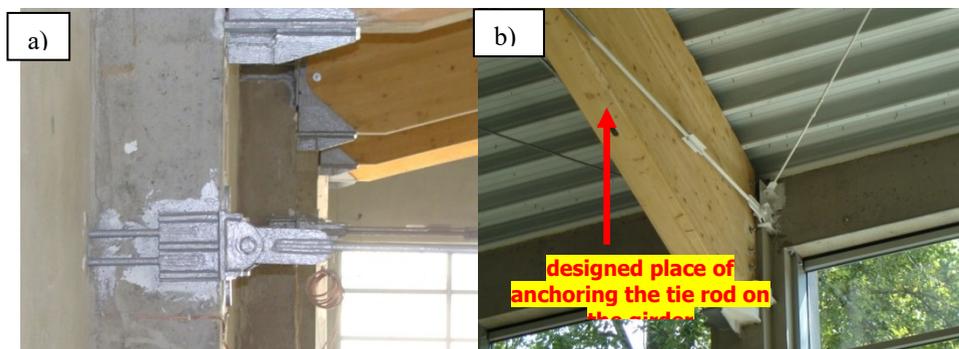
Fixing the tie rod of laminated timber roof girders, a) in axis 5 b) in axis 10
